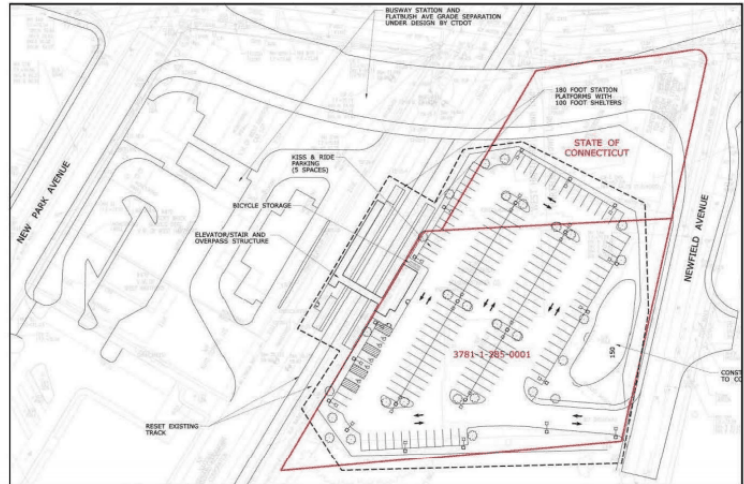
Proposed West Hartford Station Plan, Hartford Rail Alternatives
